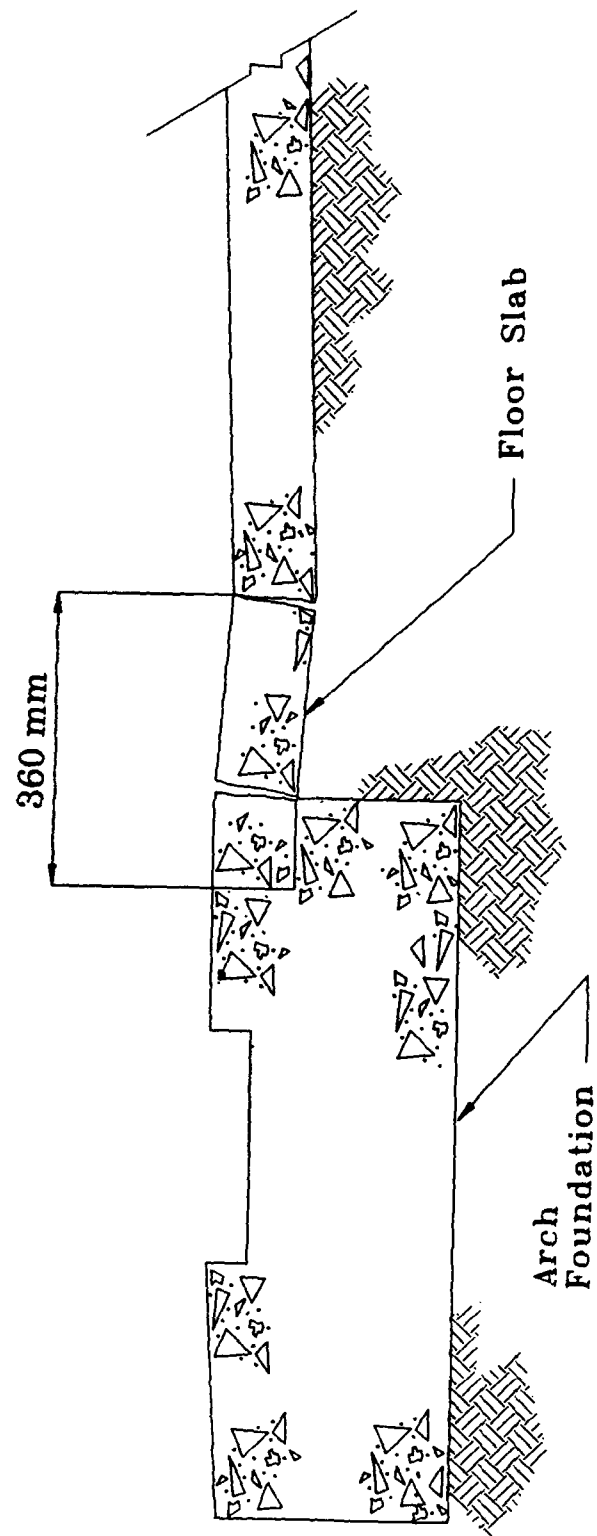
Section: Crack pattern in floor slab at arch foundation, PAS-4.
